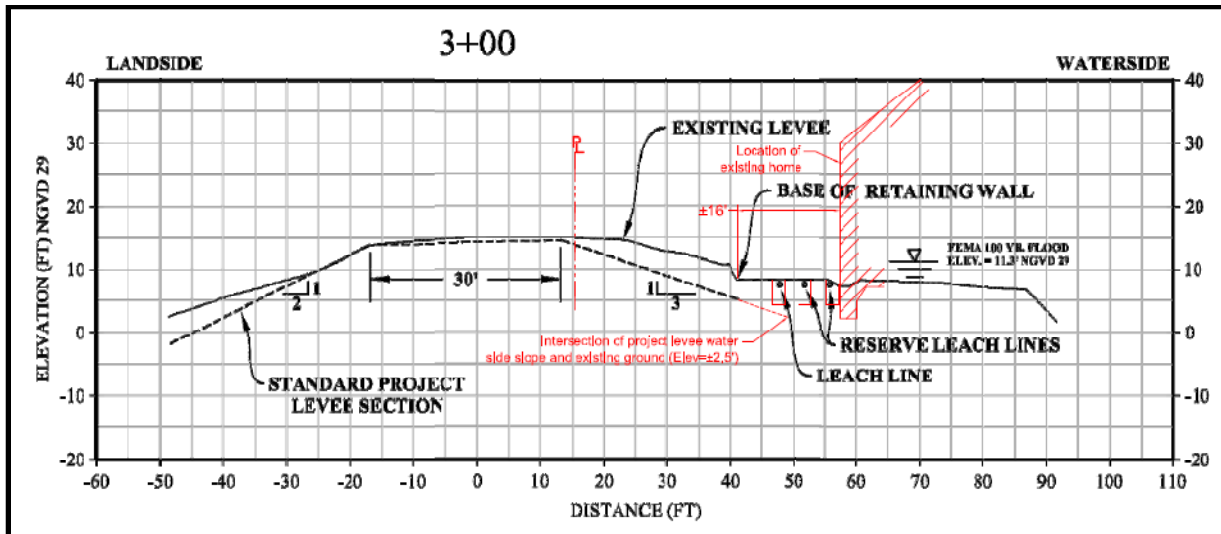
Site cross section, labels added by CVFPB Staff (Source: MBK Engineers plans dated 12/9/10, Sheet 3 of 3).
